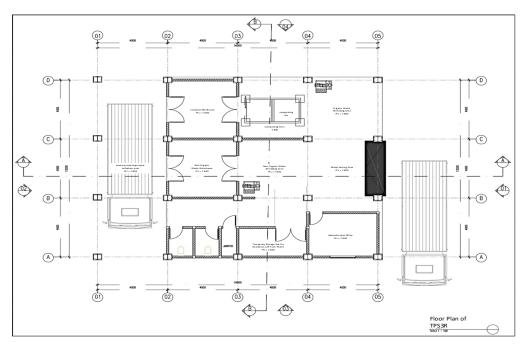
Building plan the waste management site reduce-reuse-recycle (TPS3R).
